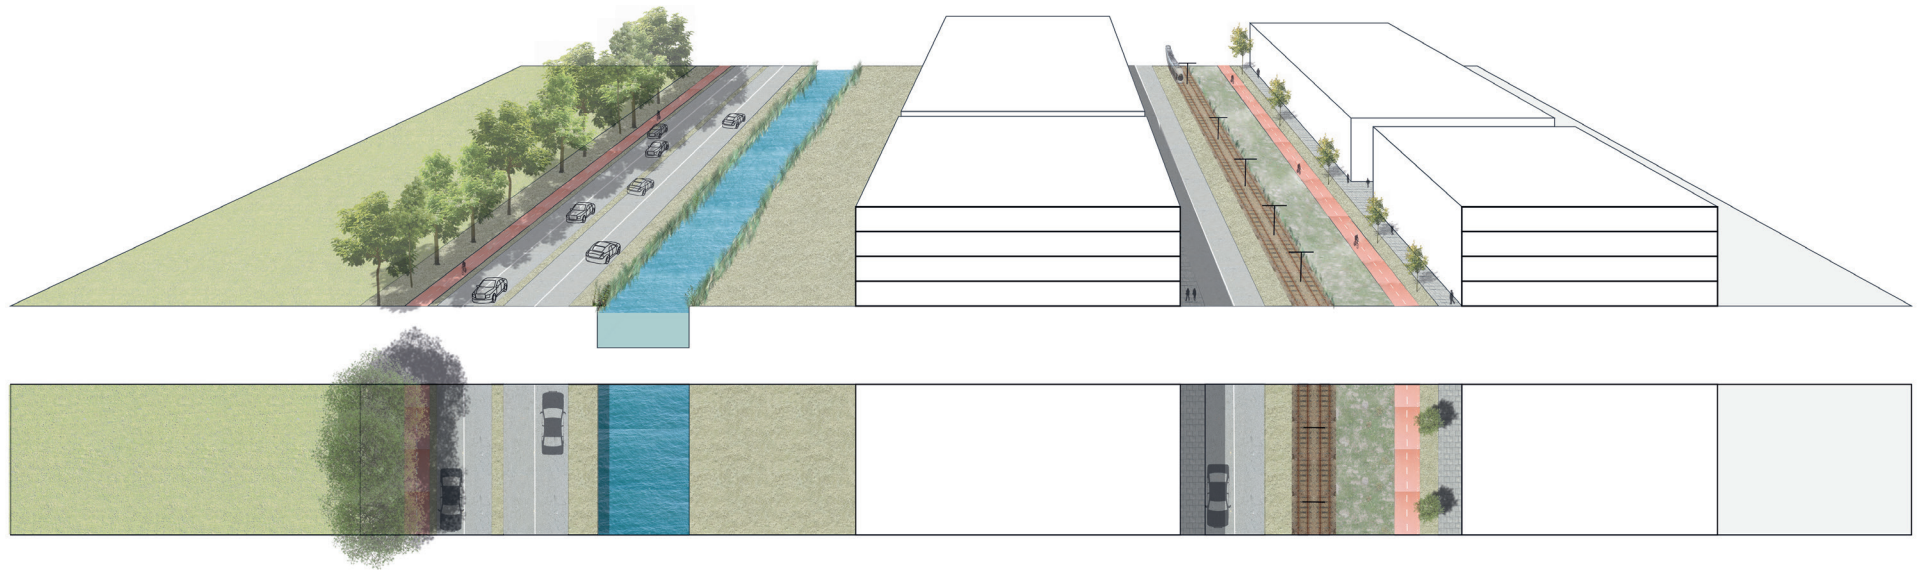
Current spatial section of the Haarlemmertrekvaart and Brettenscheg connection.
